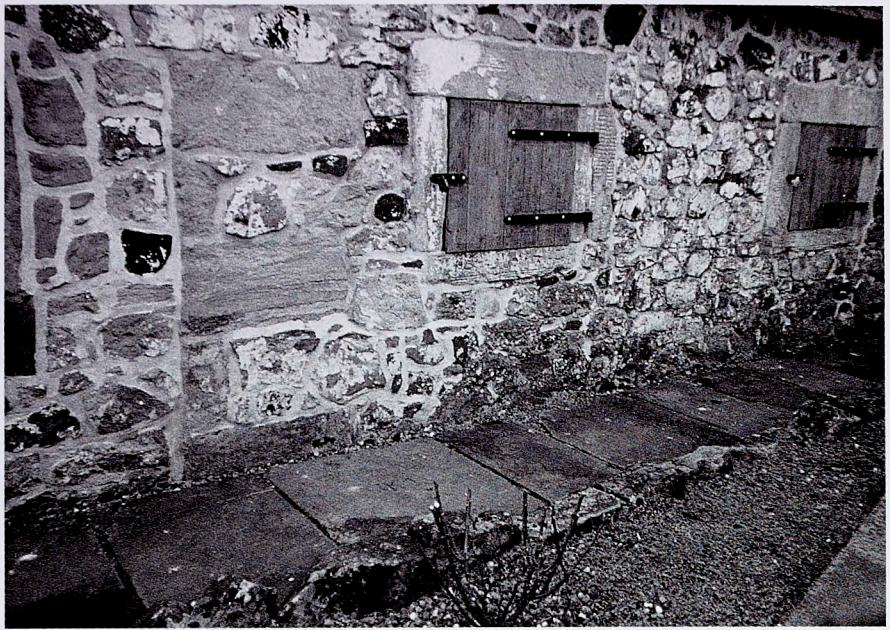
Back (east) wall of No. 11, showing rectangular corner stones.
